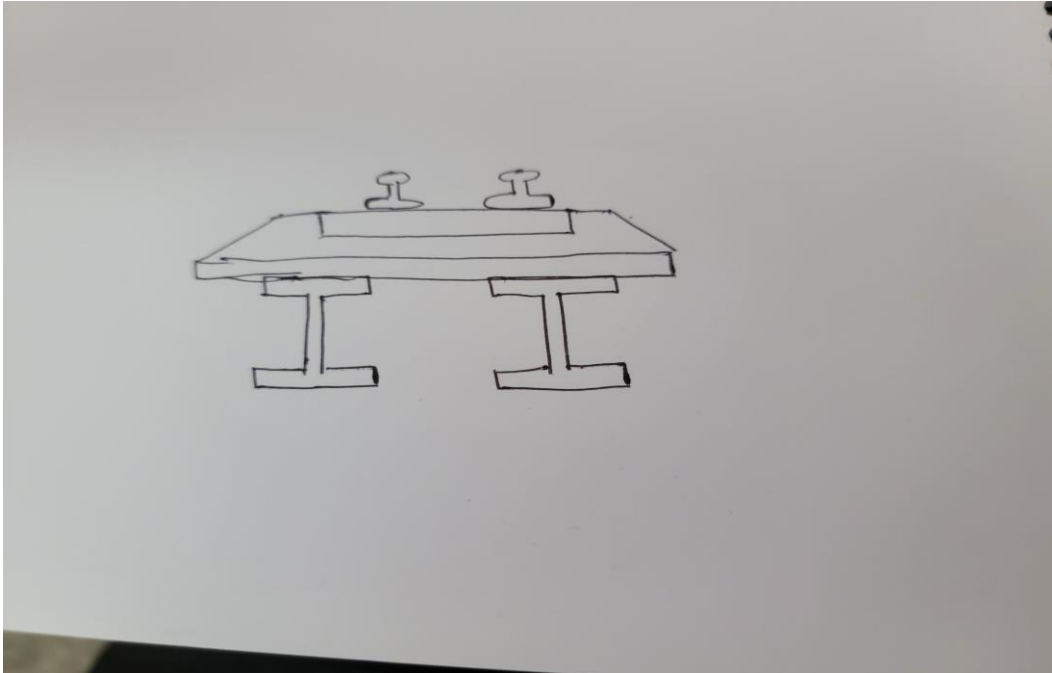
Rail track, wooden sleeper, concrete slab placed as subgrade with steel girder and fiber-reinforced polymer deck
